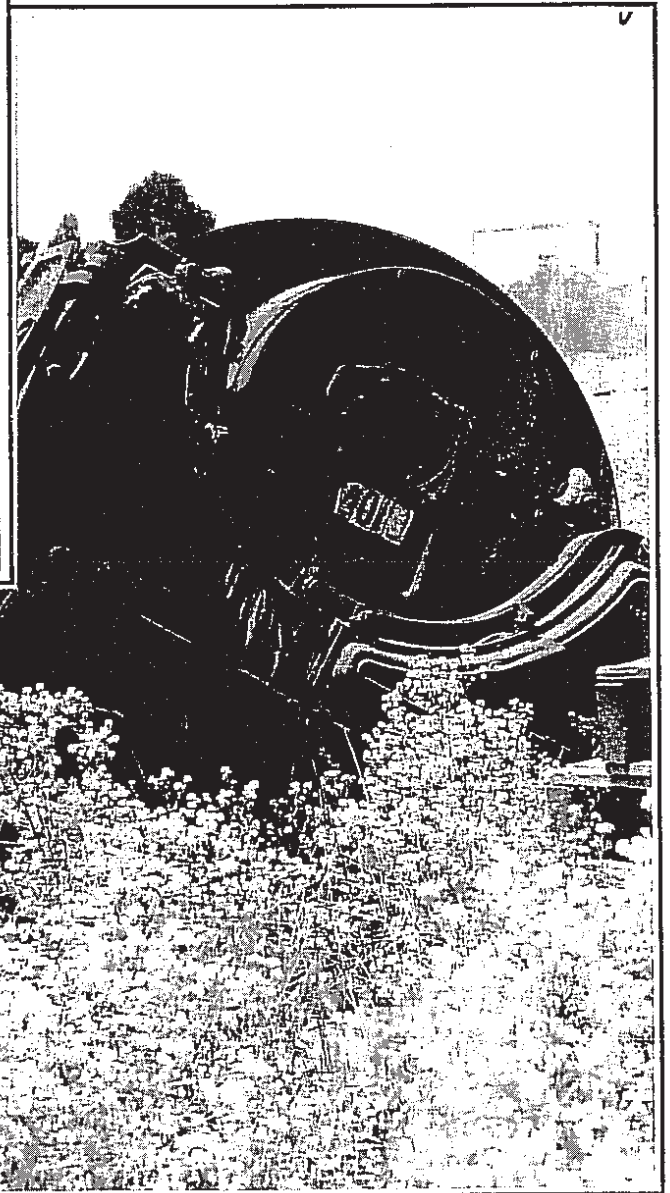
Old boiler deposited in debris area appears to contain friable asbestos liner.
